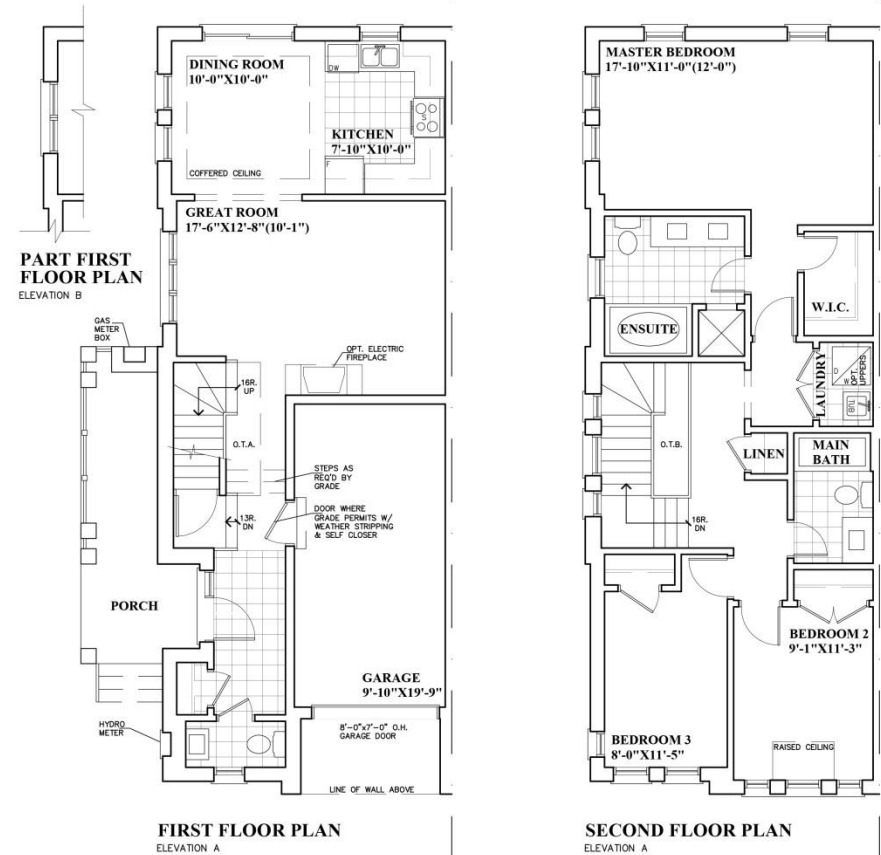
Floor Plan of Corner Unit with Recessed Garage
